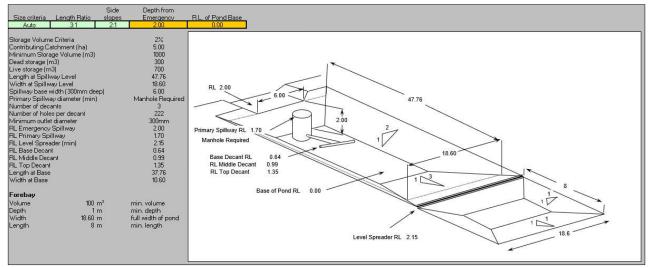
Sediment retention pond design details for SRP-1 and SRP-2.
